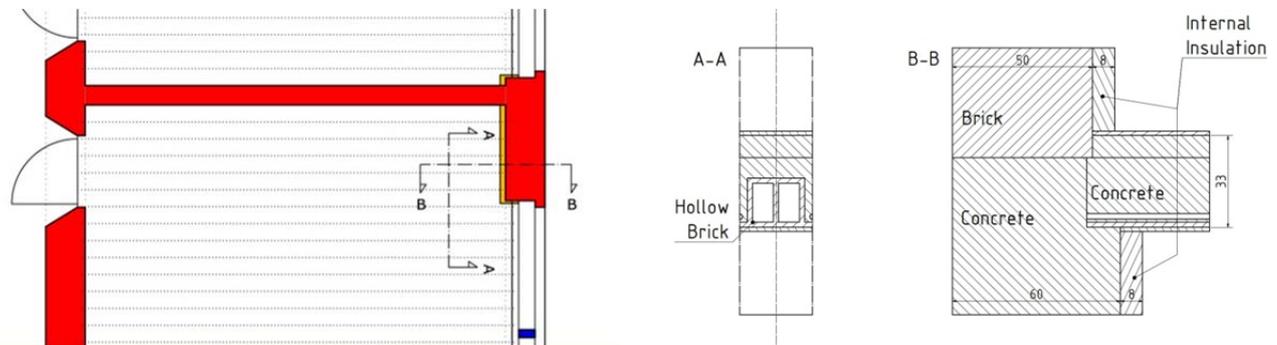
Floor plan detail (left) and Ceiling-wall section (right), School in Hötting, Innsbruck
